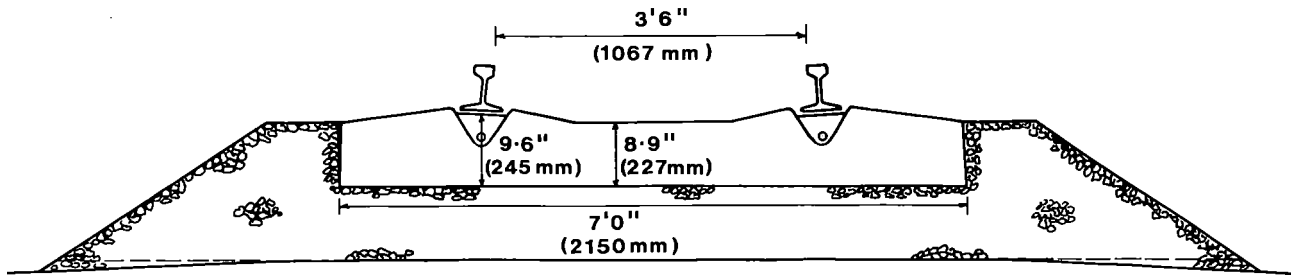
TYPICAL CROSS SECTION NEW CONCRETE SLEEPER.
